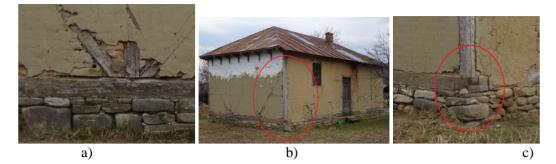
a) Stone foundations (river rocks); b) bracings positioned at the corner's house; c) crosshalved joints
